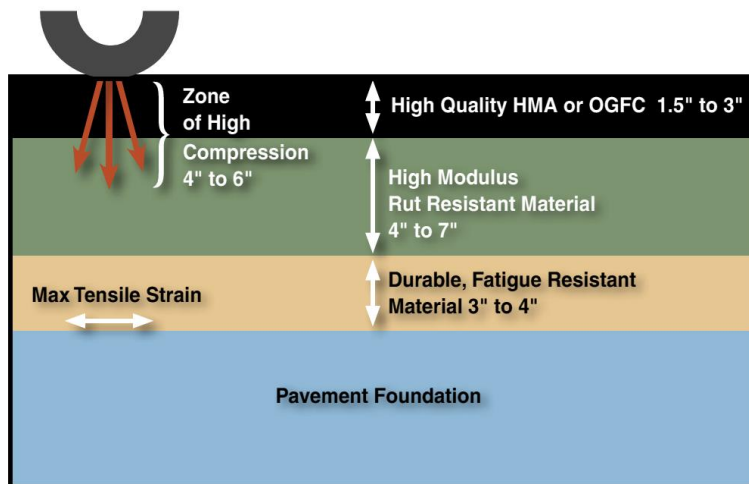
Three layer concept of a perpetual pavement asphalt layer [13]
